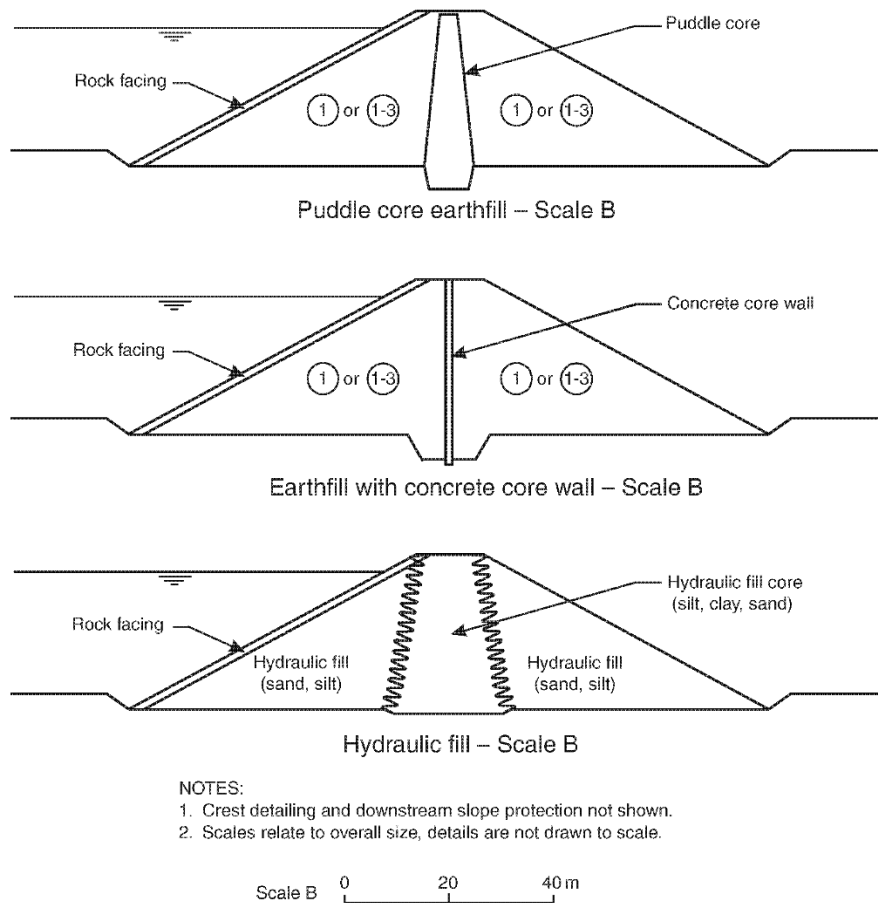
Typical cross-sections of some earlier types of dam (after Fell et al. 2005)
